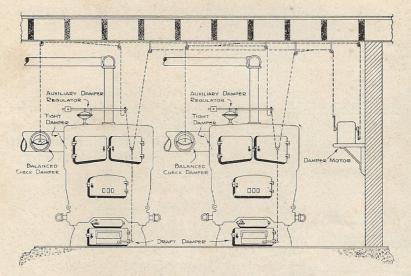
Method of Installing Damper Chains (Two Boilers)
